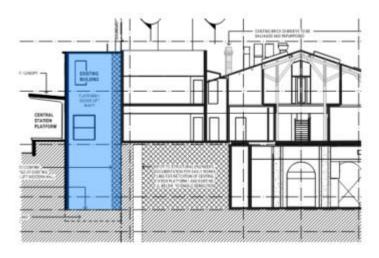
Cross-Section Elevation View of Goods Lift Core (BVN Dwg. AR-23D-GXX-01[5])
